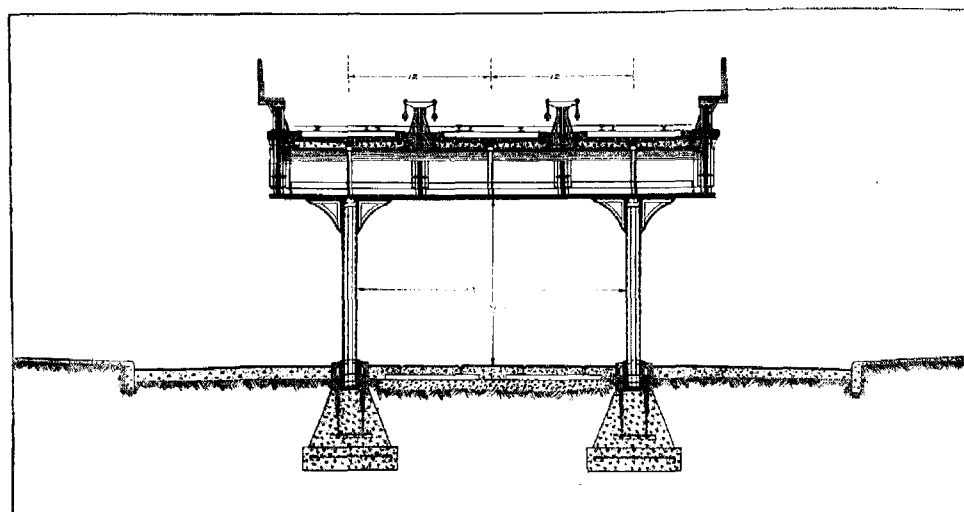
Three-track ballasted deck elevated railroad with double columns in roadway--cross-section between stations.
